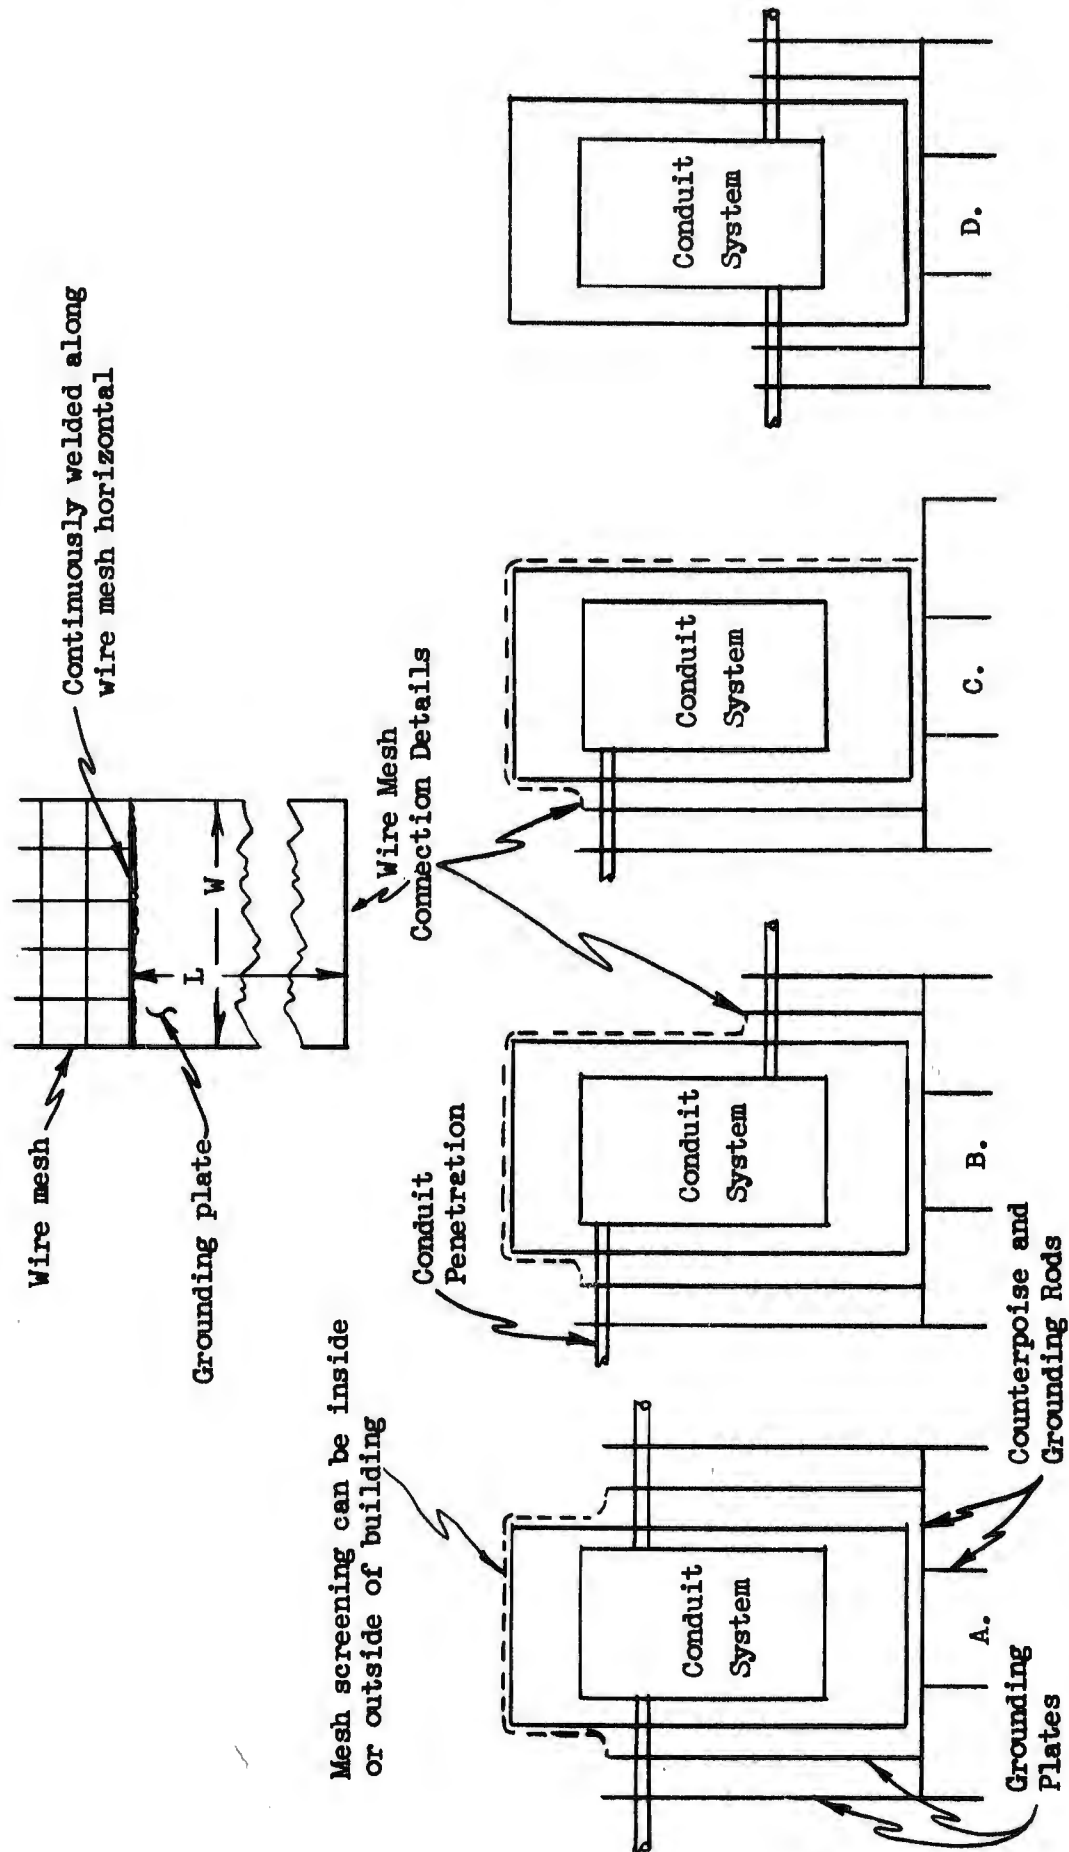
Typical Installations for Conduit Penetrations at Heights Greater than 1/2 Total Building Height showing Methods of Wire Screen Connection. Does not apply to overall metal shielded buildings.
